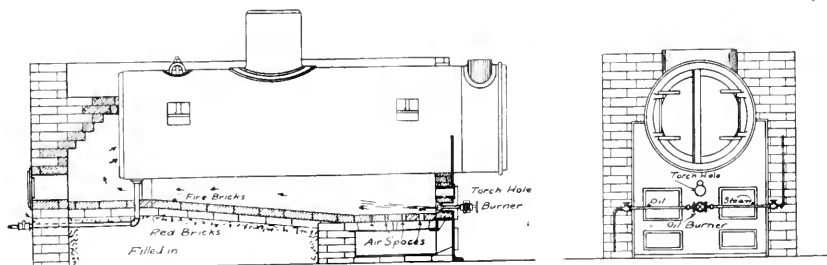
Arrangement of Return Tubular Boiler for Oil Burning.
